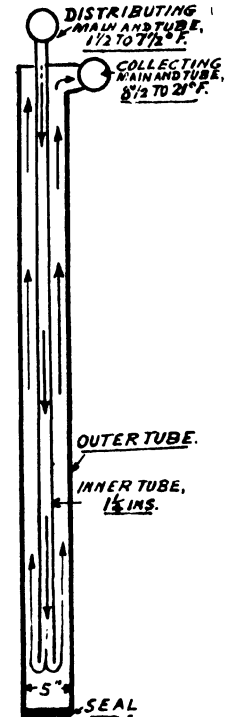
A.—Section on line AB, showing Freezing-tubes.
